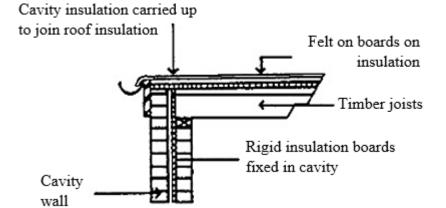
Wall insulation joined to roof insulation (Emmitt & Gorse, 2005)
